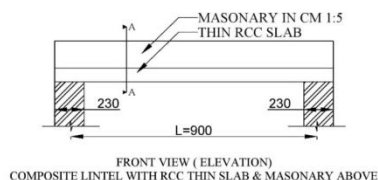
Longitudinal section / Elevation of the TRBWCL.
